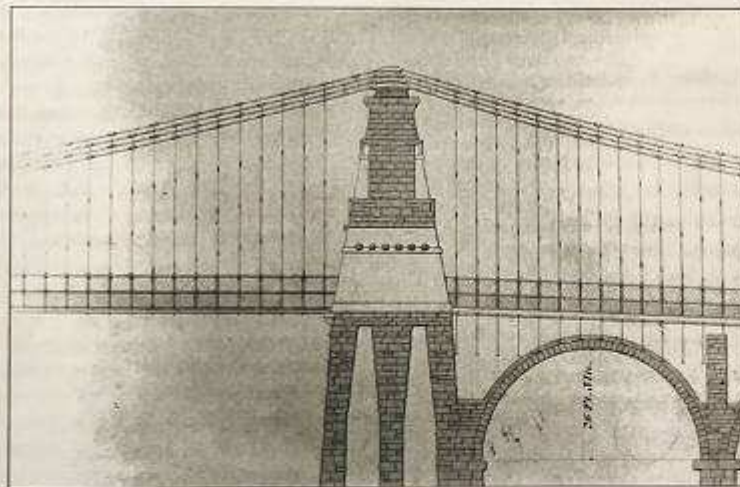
Menai Bridge, 1819-26—cross-section through tower⁵³ (W. A. Provis)
